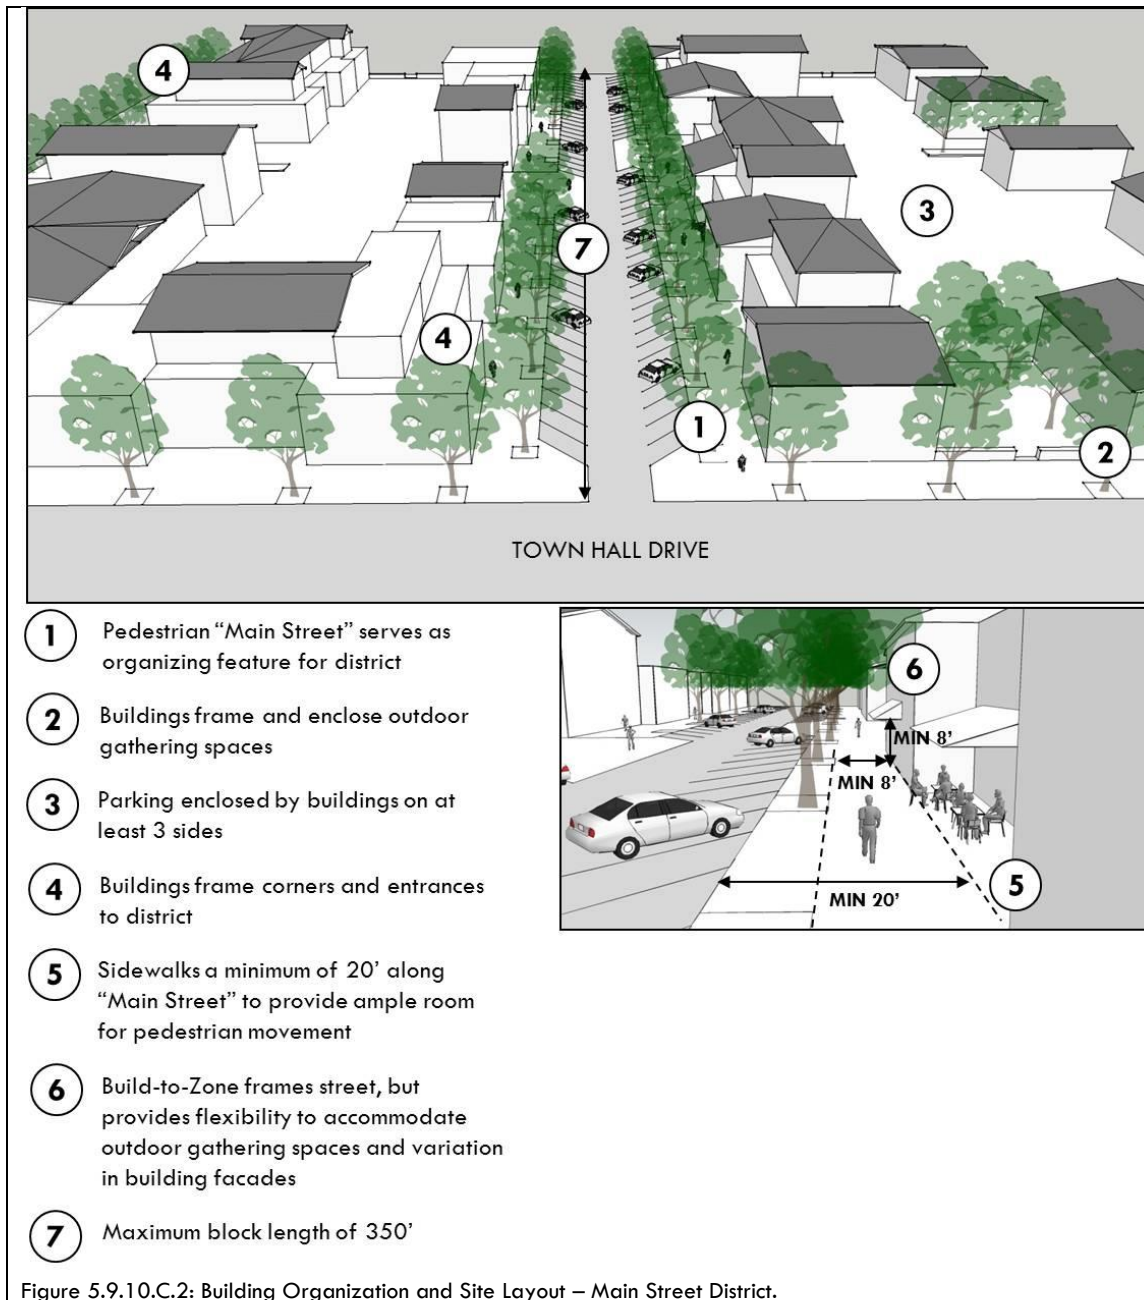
C.2: Building Organization and Site Layout – Main Street District.
